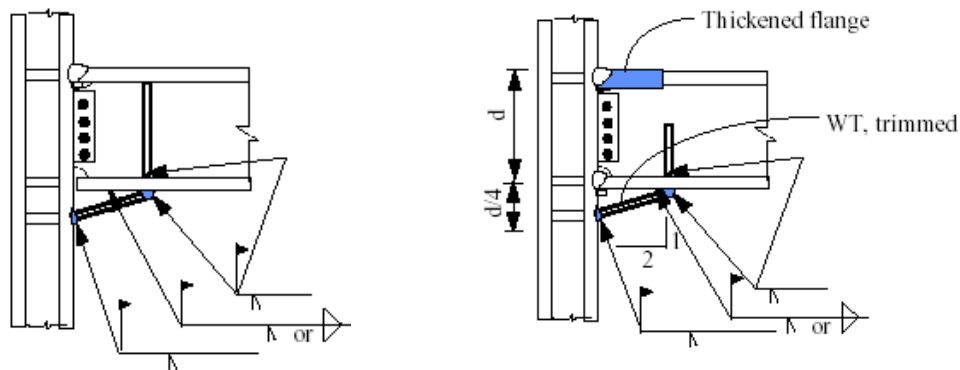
Welded bottom haunch connections: unreinforced top flange and bottom flange not welded (*left*), reinforced top flange and welded bottom flange (*right*).
